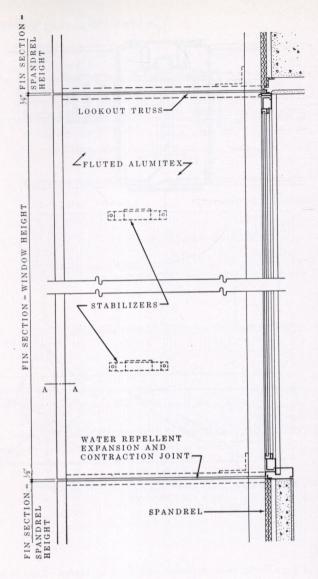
Vertical solar fin elevation. For plan and section details, see Page 281.
